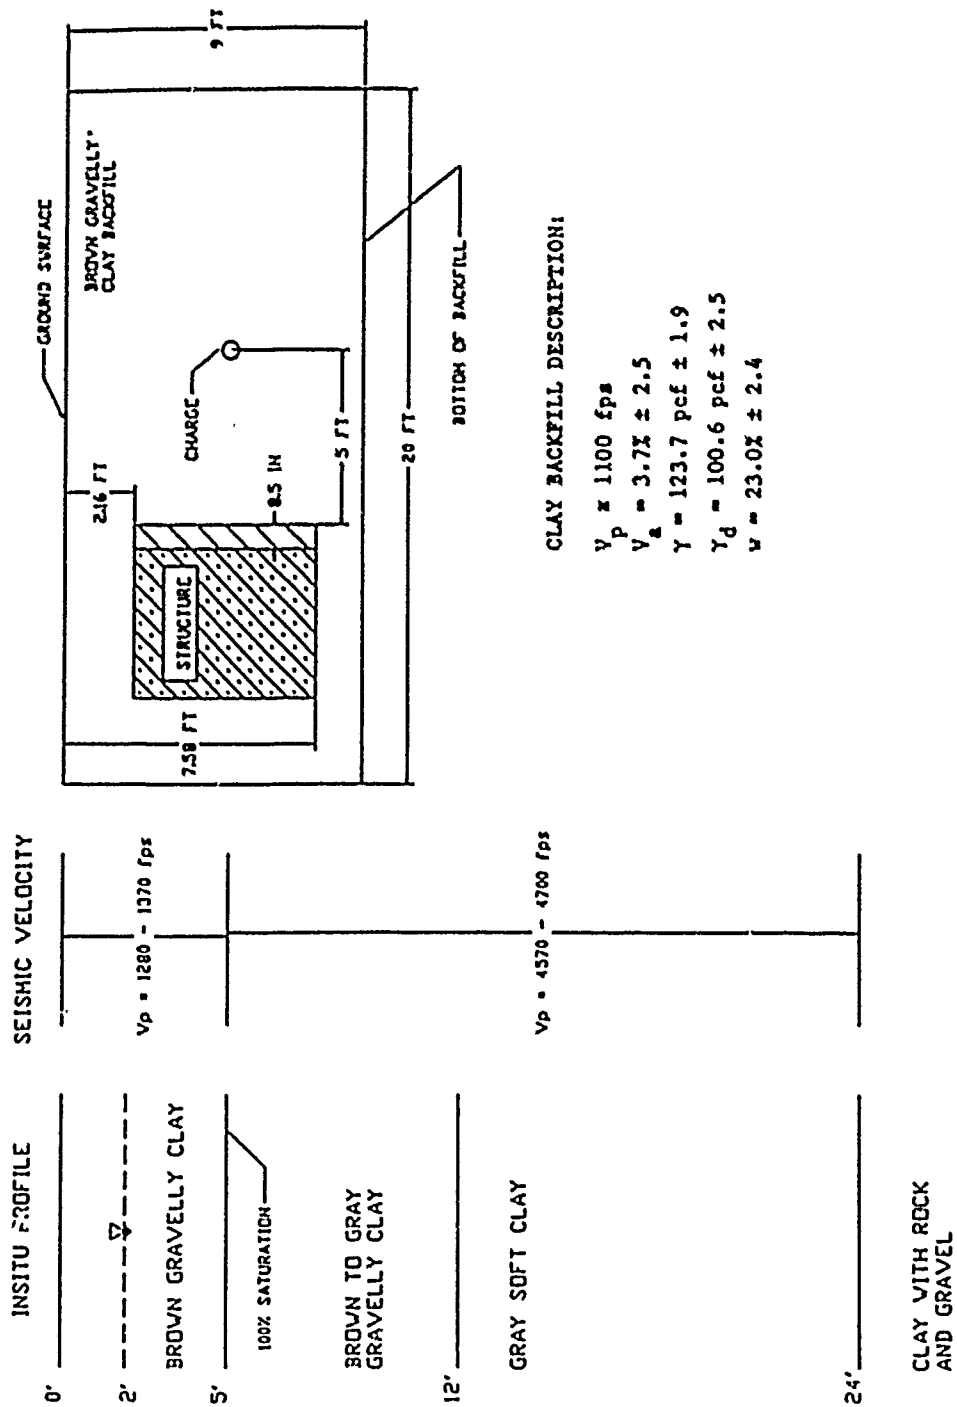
Section through Backfill Test 2 test bed and in-situ profile.
